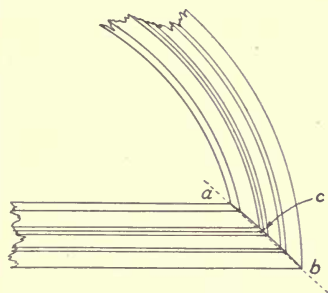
JOINTING A STRAIGHT AND A CURVED MOLDING.
